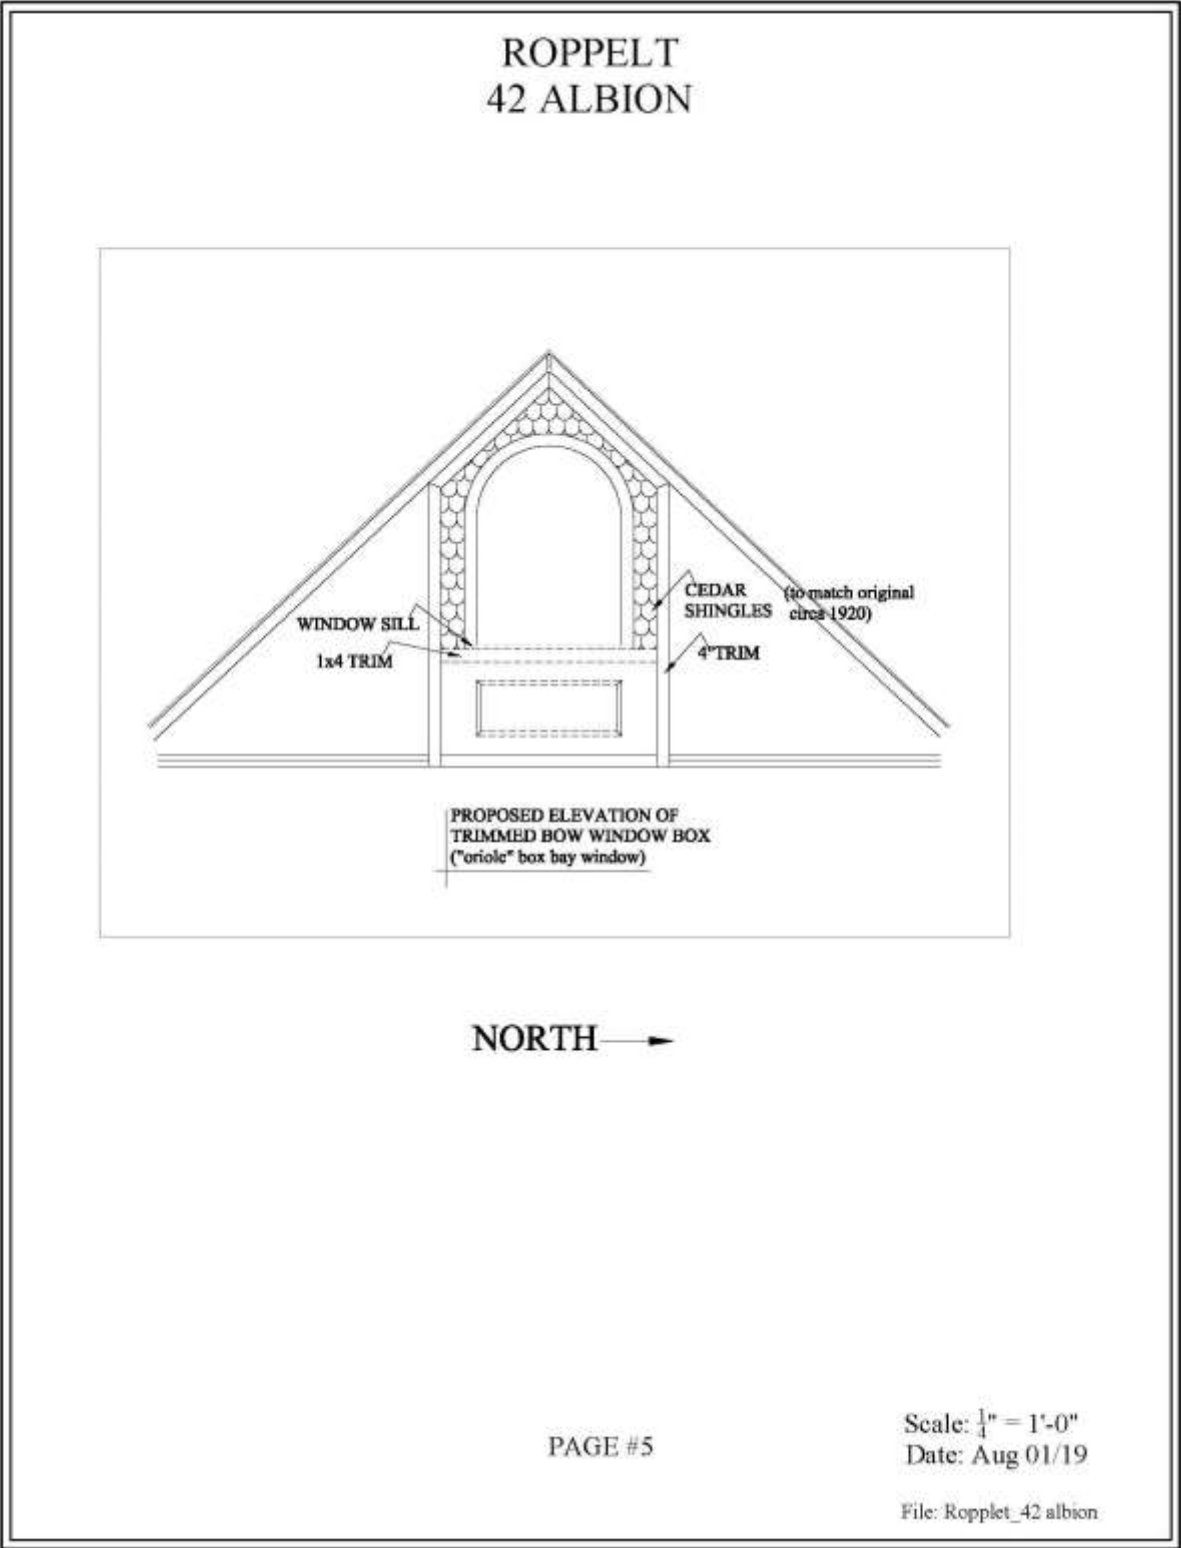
Detail showing exterior finishes of proposed oriel window of the house at 42 Albion Street. Note the existing window is a sash window with separate arched transom (see Image 3, Appendix B).
